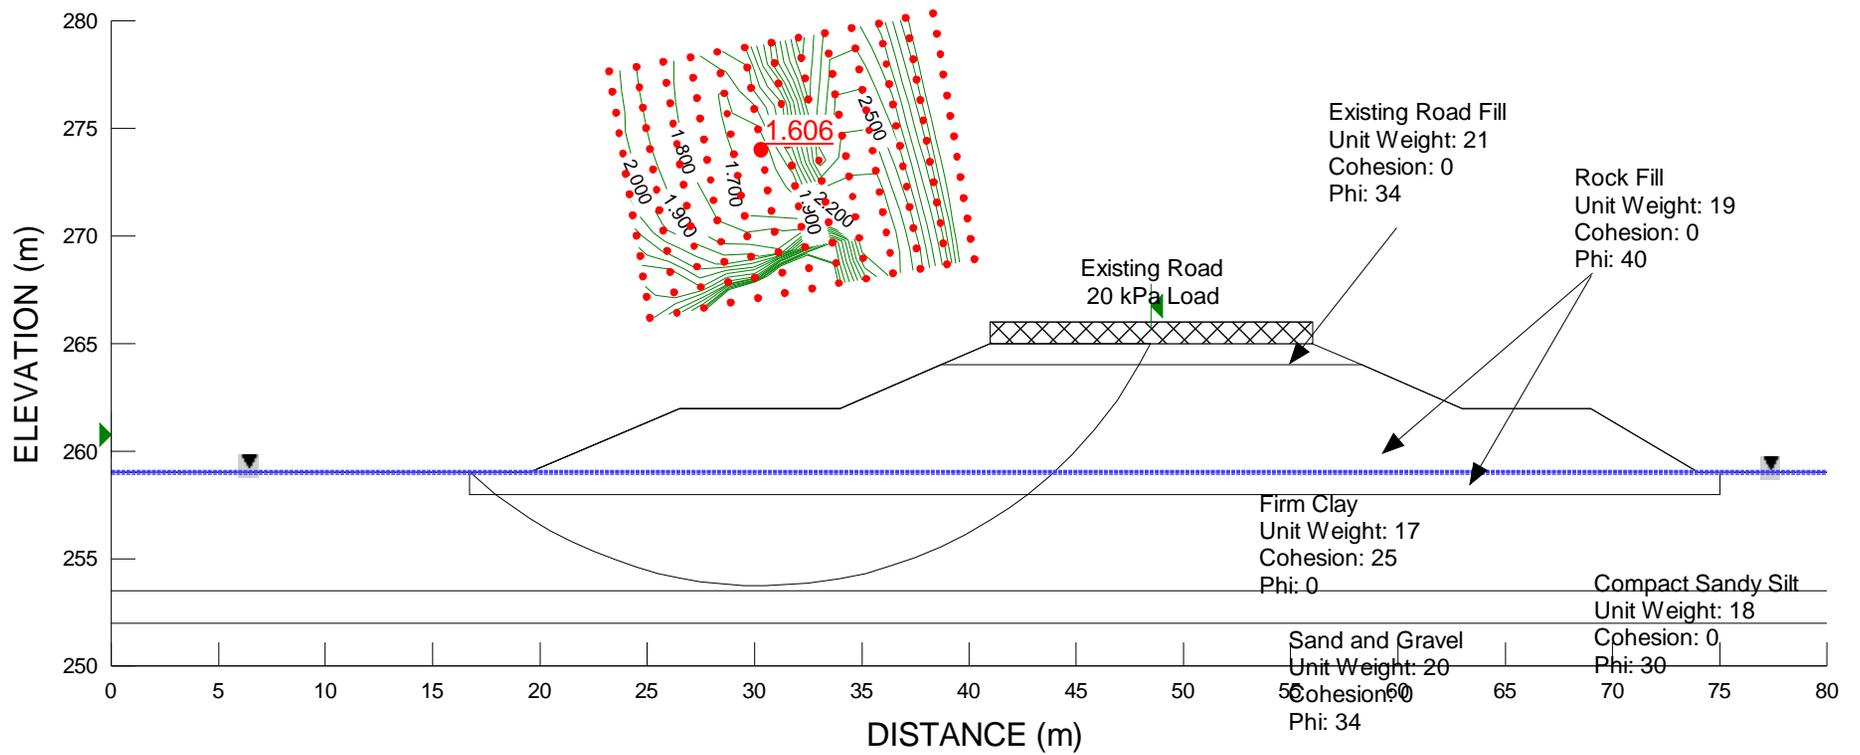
Slope Stability Analysis of Section at Station 18+725 with 4 m Road Widening (End of Construction - Slip Surface within Westbound Lane)
